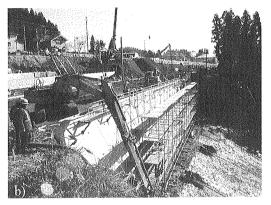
Reconstruction of damaged retaining wall along National Highway Route 17 and the adjacent embankment along JR Joetsu line (site 3 in Figure 1)
